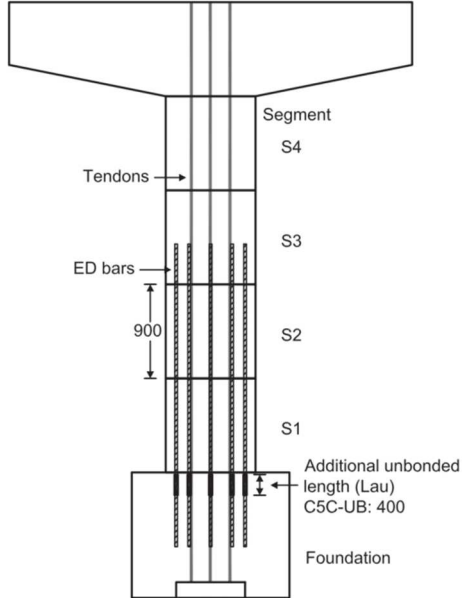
Segmental concrete bridge columns with steel reinforcing bars as energy dissipation bars and internal unbonded posttensioning (Reprinted from Ou et al. 2010).
